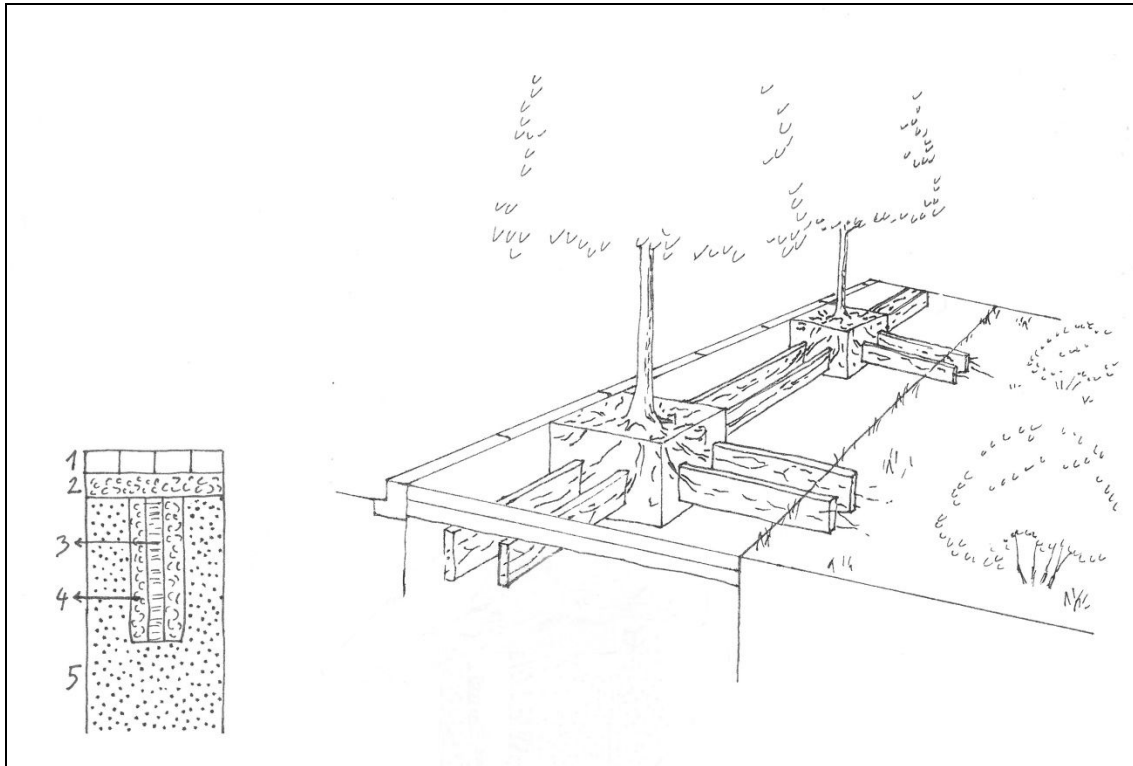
Example of root zone bridging in street avenue – one possible type of root path (5.13): 1 – pavement, 2 – gravel bed, 3 – drainage, 4 – cultivation substrate, 5 – natural earth.
